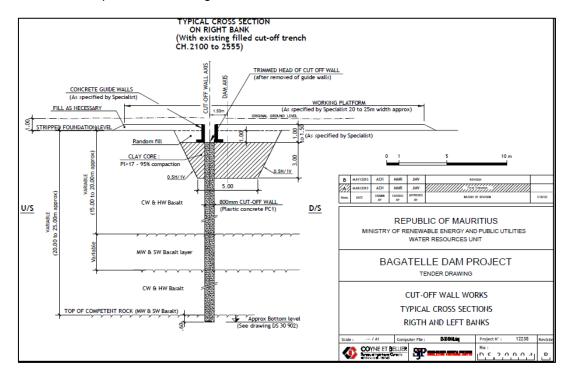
Tender drawing showing working platform, guide wall and cut-off wall (black)
